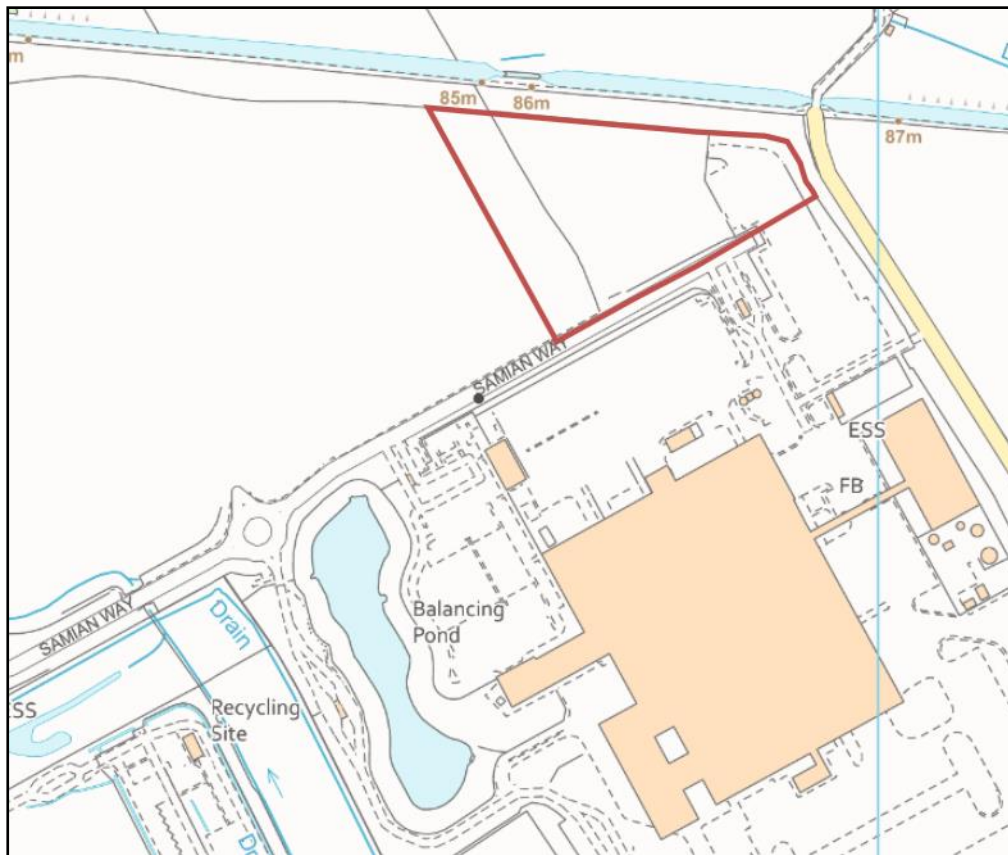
A Site Plan showing the Olleco Facility outlined in Red
